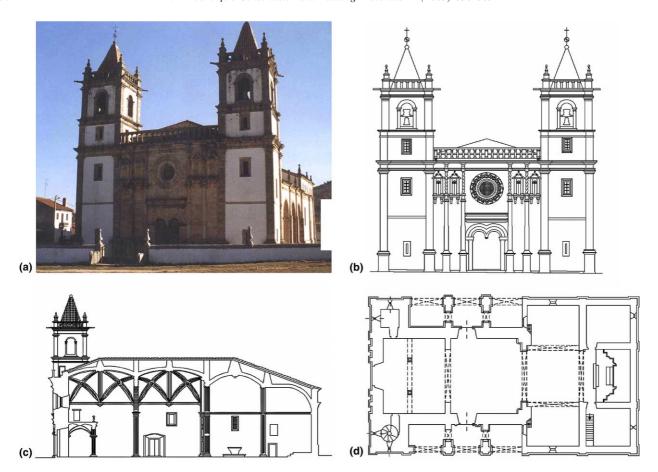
Geometry of the church: (a) perspective; (b) front view; (c) longitudinal section; (d) plan section.
